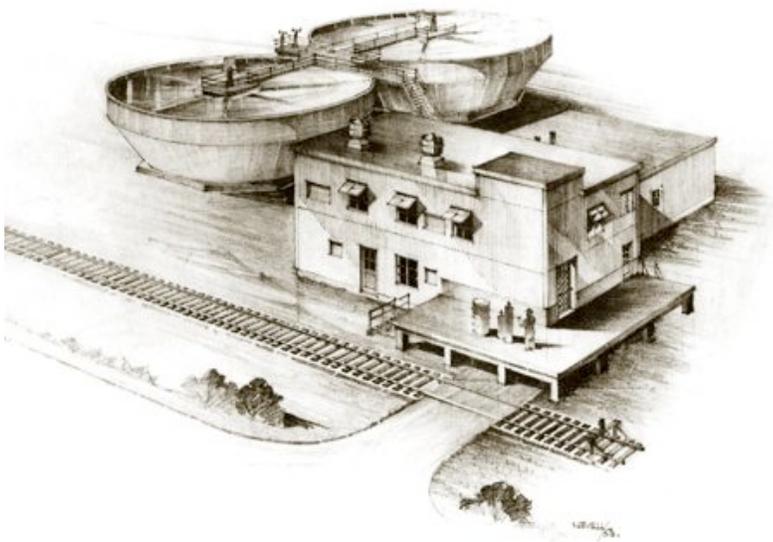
Drawing of Building 183-2, Filter and Softener Plant, by Gibbs and Hill.
